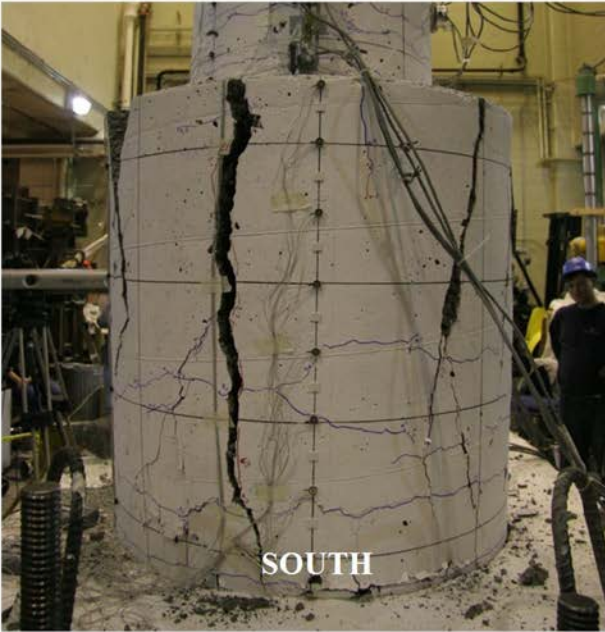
Photos. Specimen DS-2 shaft damage after cyclic testing.
